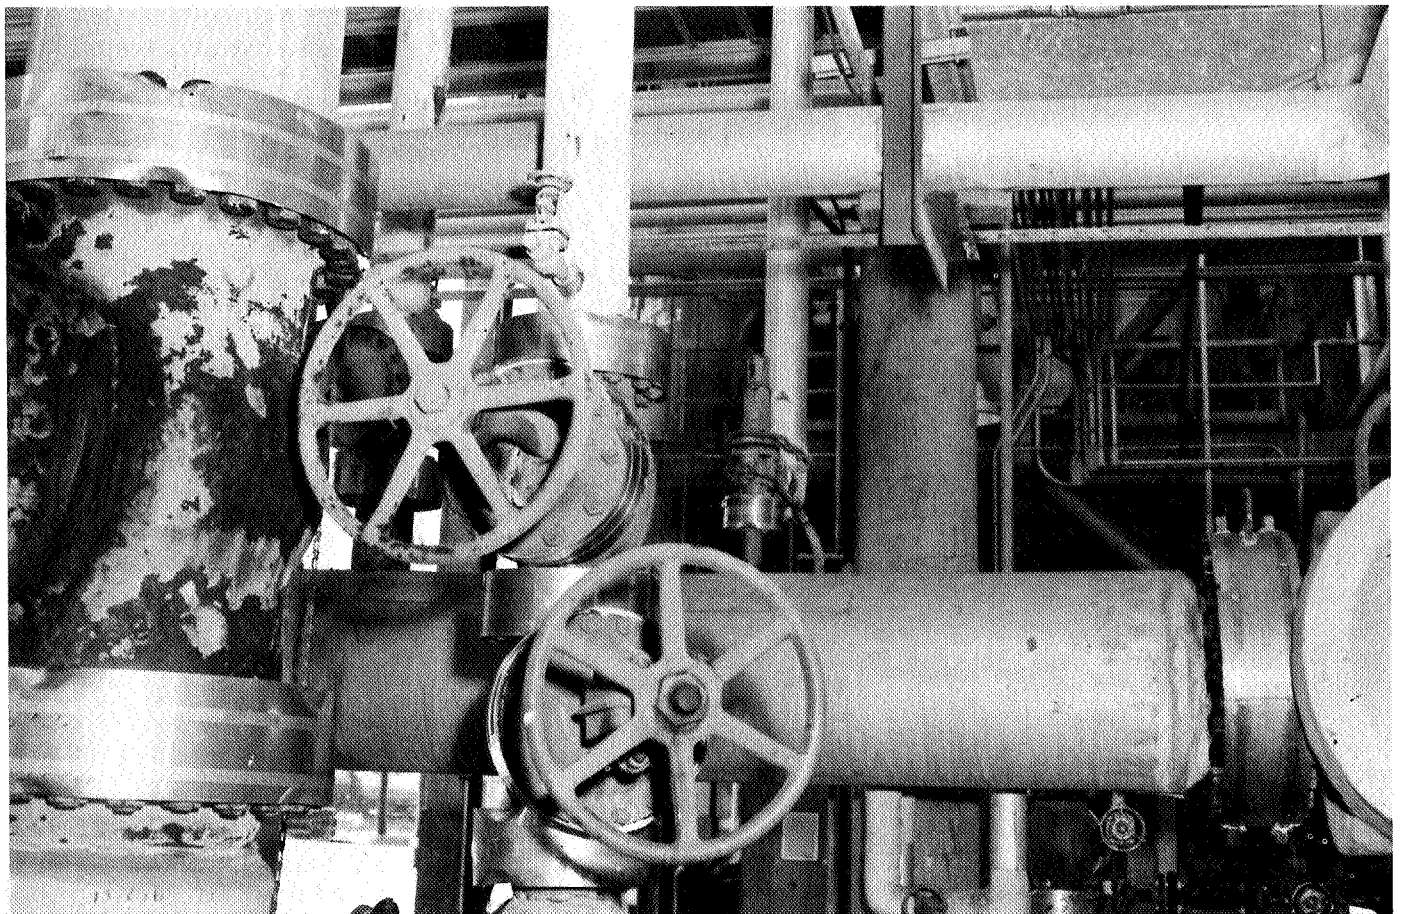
Multiple flange locations expose major electrical wiring and overhead instrument tubing to damage in event of fire.
